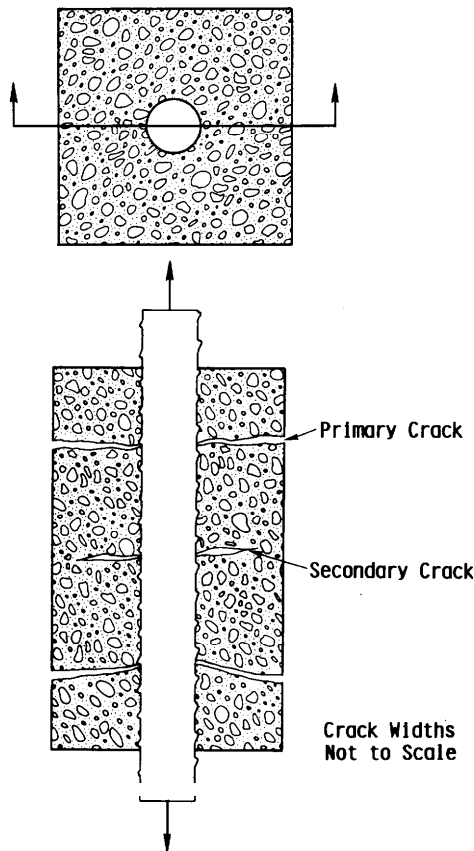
Primary and secondary cracks in a reinforced concrete tension member
